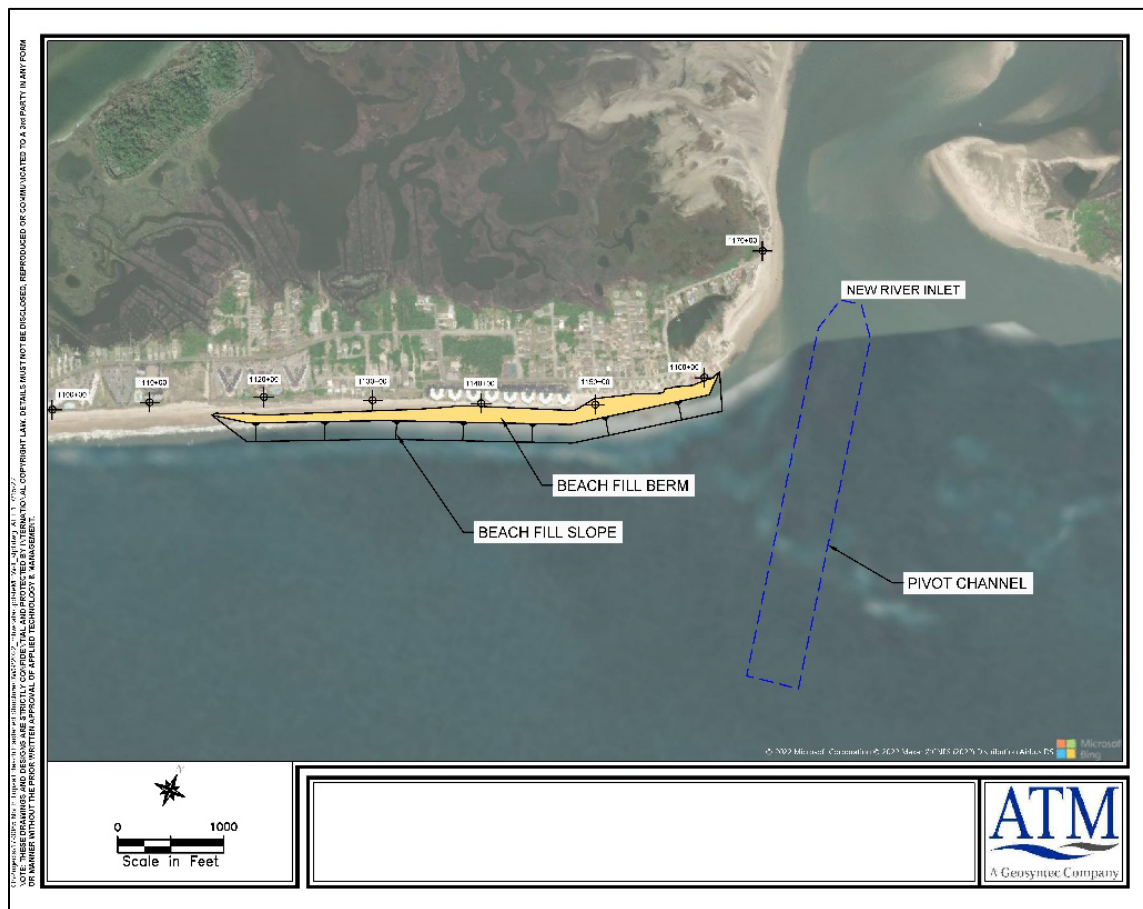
Alternative 1 Beach Fill and Pivot Channel Layout
